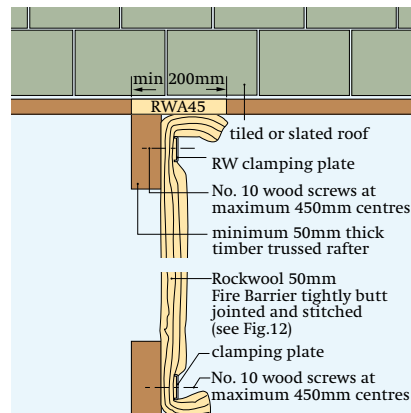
Half hour protection for timber truss construction 50mm thick or more. Note: Nail plate protection required – see Figure 6
